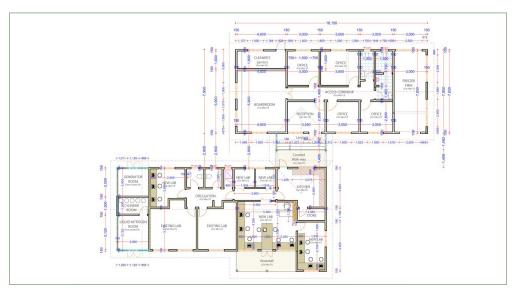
Architectural plan for the remodeled Kasangati building that will house various labs and a post-doc lounge
